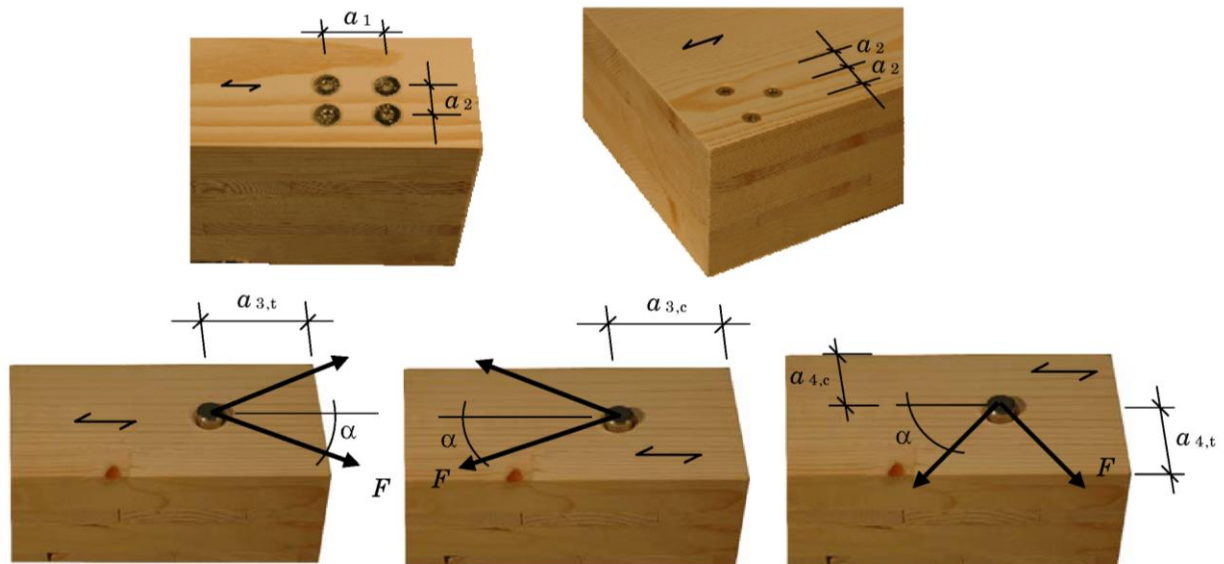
Definitions of minimum spacings, edge and end distances for laterally loaded dowel-type fasteners in the plane side of cross laminated timber
